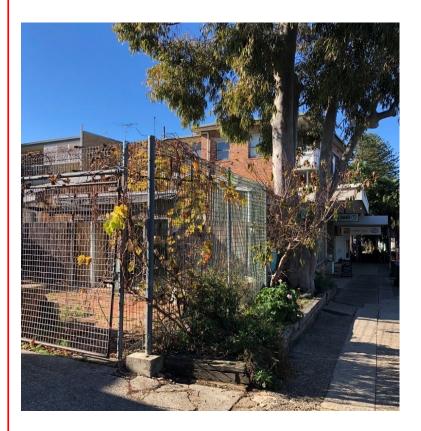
View of existing site, looking west, showing the existing three storey form thereon, with ground floor retail
